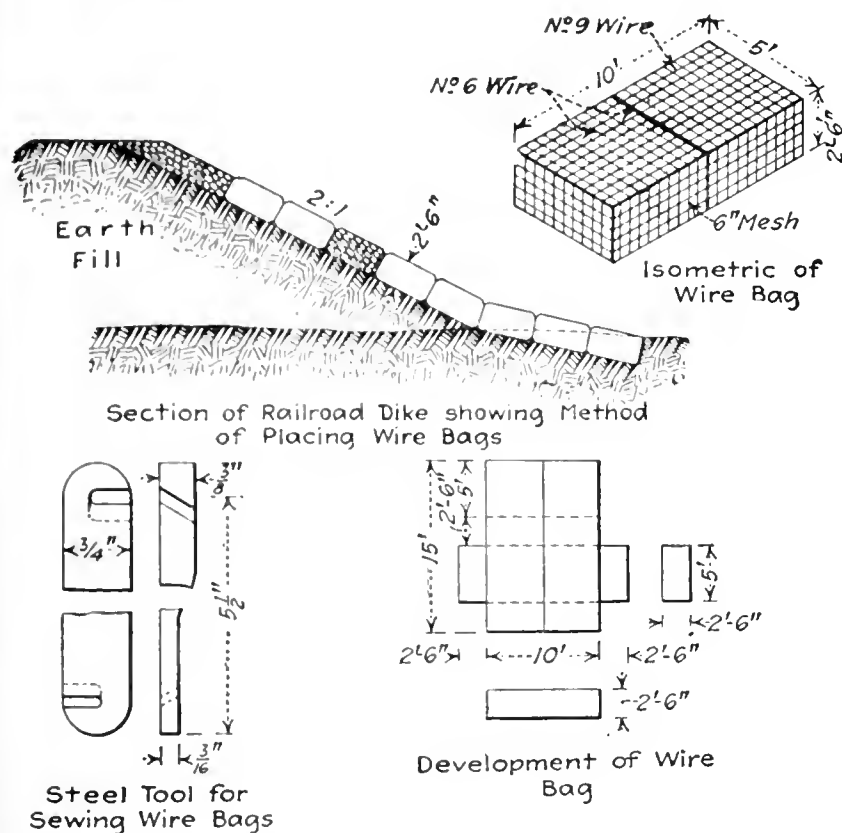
DETAILS WHICH SAVE TIME AND LABOR ON CONSTRUCTION WORK
